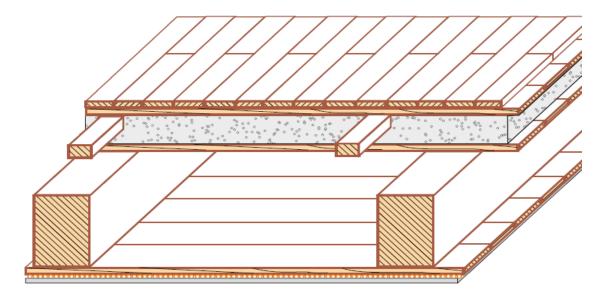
Components of a typical flexible wooden floor of a URM building in Croatia (Koški et al. 2012).
